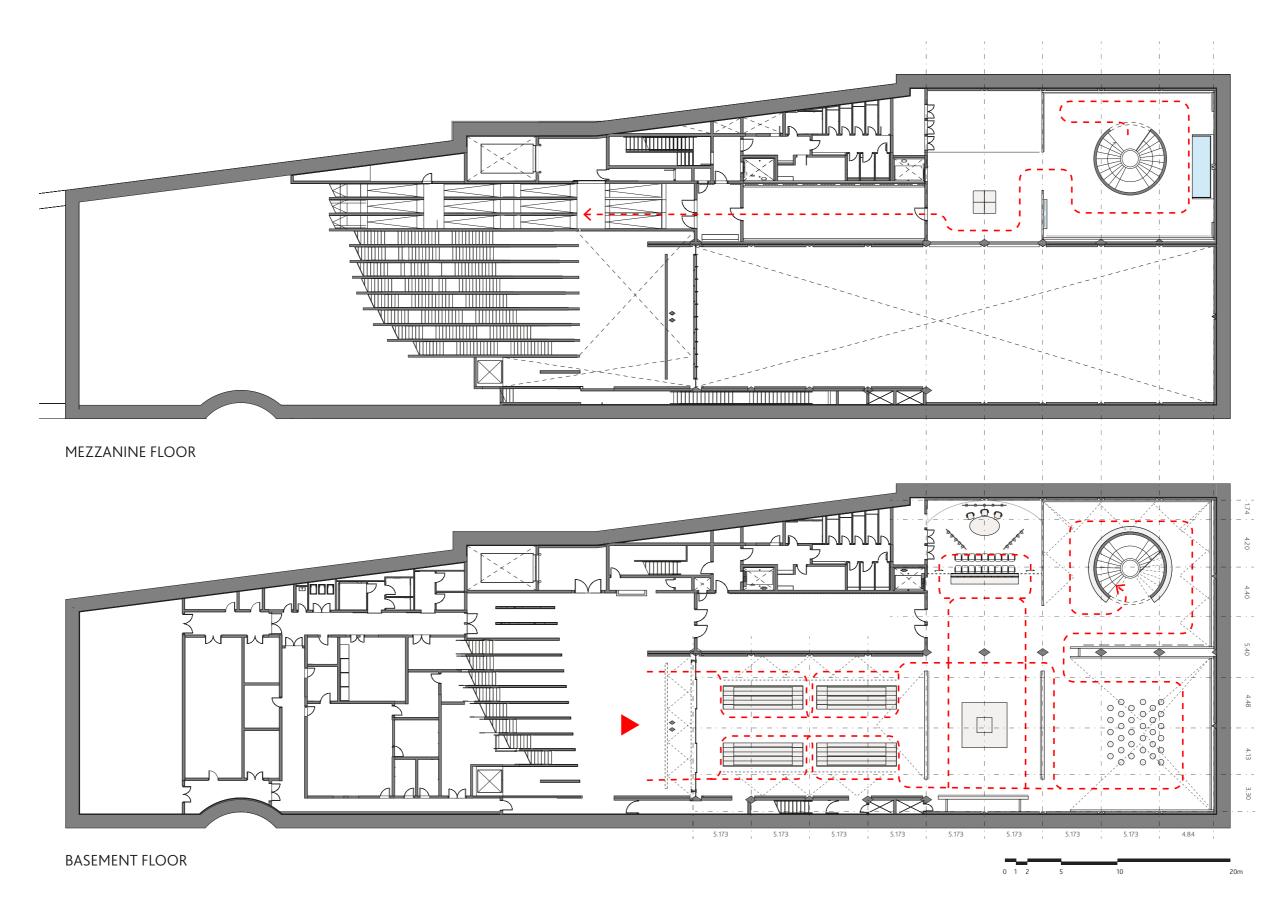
Mezzanine and lower ground floor plans of the UKHMLC at January 2020
